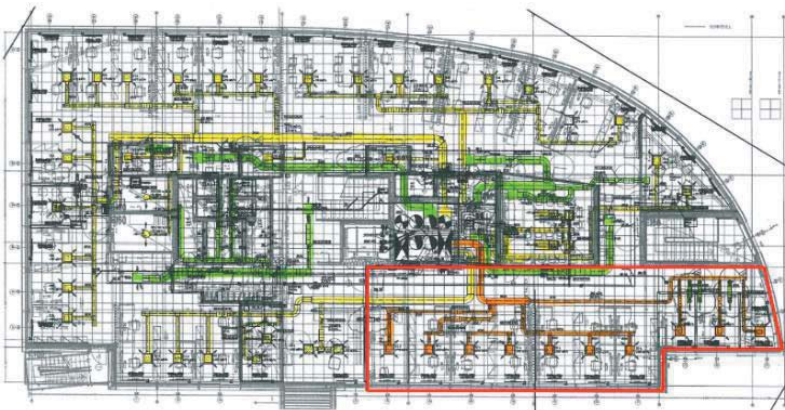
Building floor and ventilation duct layout. Supply air ducts in yellow and orange. Exhaust air ducts in green. Area of interest indicated by the red frame and orange supply air ducts. This area is approx. 150 m² with a façade length of 39 m of the building perimeter.
